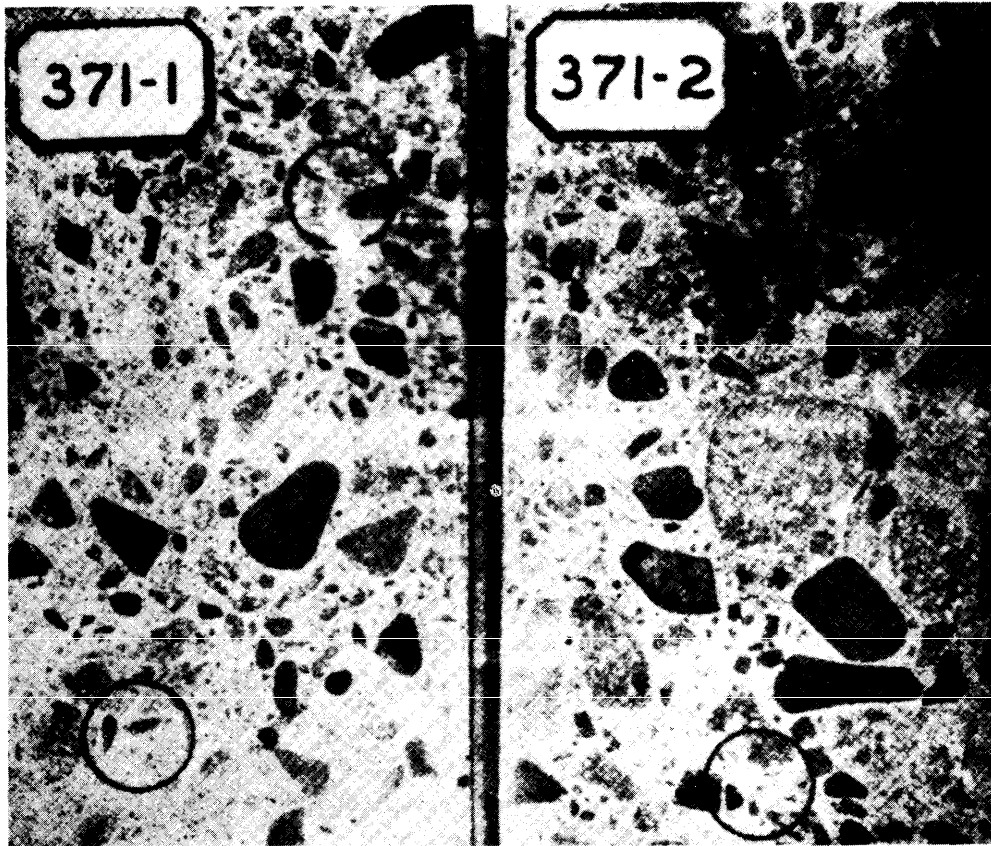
CONCRETE SLABS MARKED AND READY FOR DRILLING CORES
